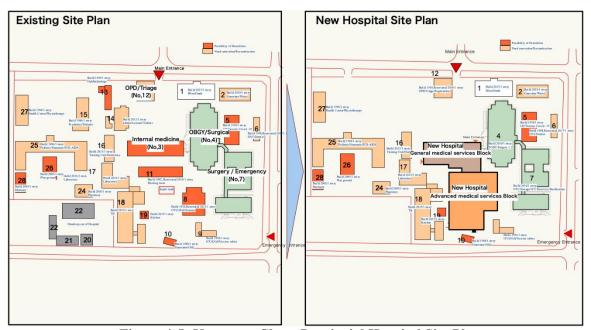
Kampong Cham Provincial Hospital Site Plan
